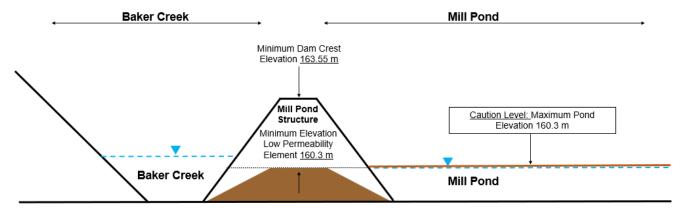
Water and Infrastructure Elevations for Mill Pond Structure and Baker Creek (not to scale)
